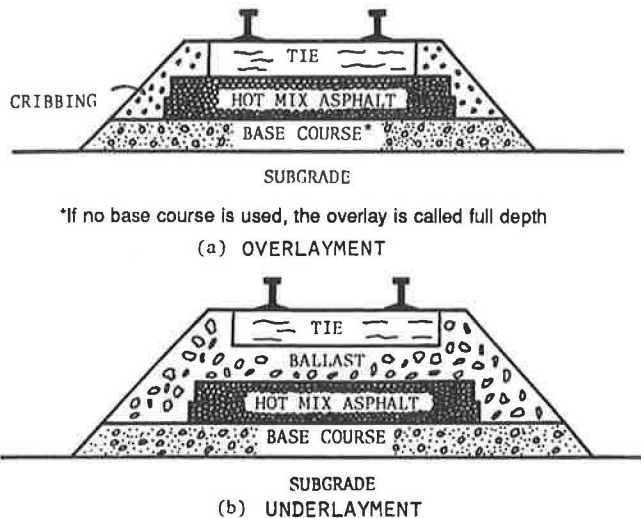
Typical cross sections of hot-mix asphalt trackbeds.
